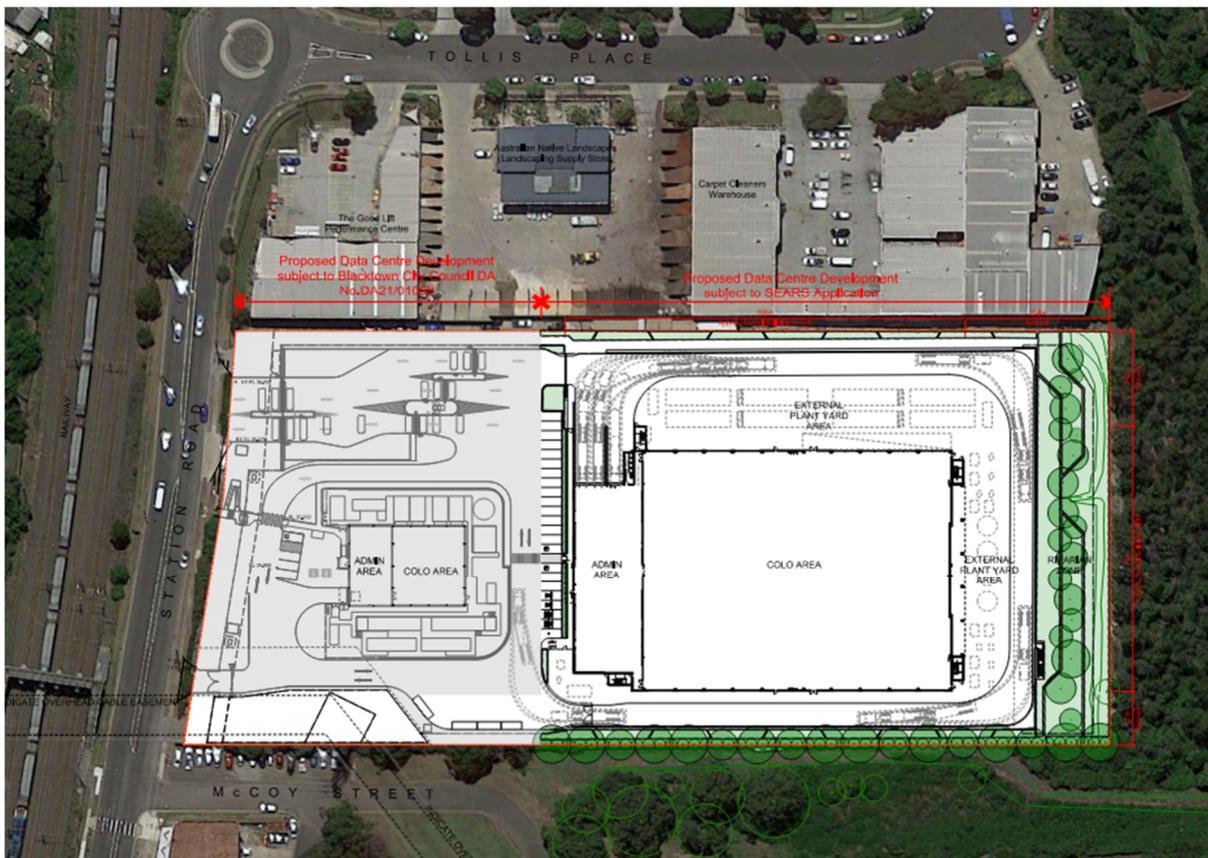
Site Plan showing approved data centre (SYD09 on the left hand side, hatched in light grey), under DA-21-01058 and the proposed SYD08 (subject to SEARs) development on the right hand side.
